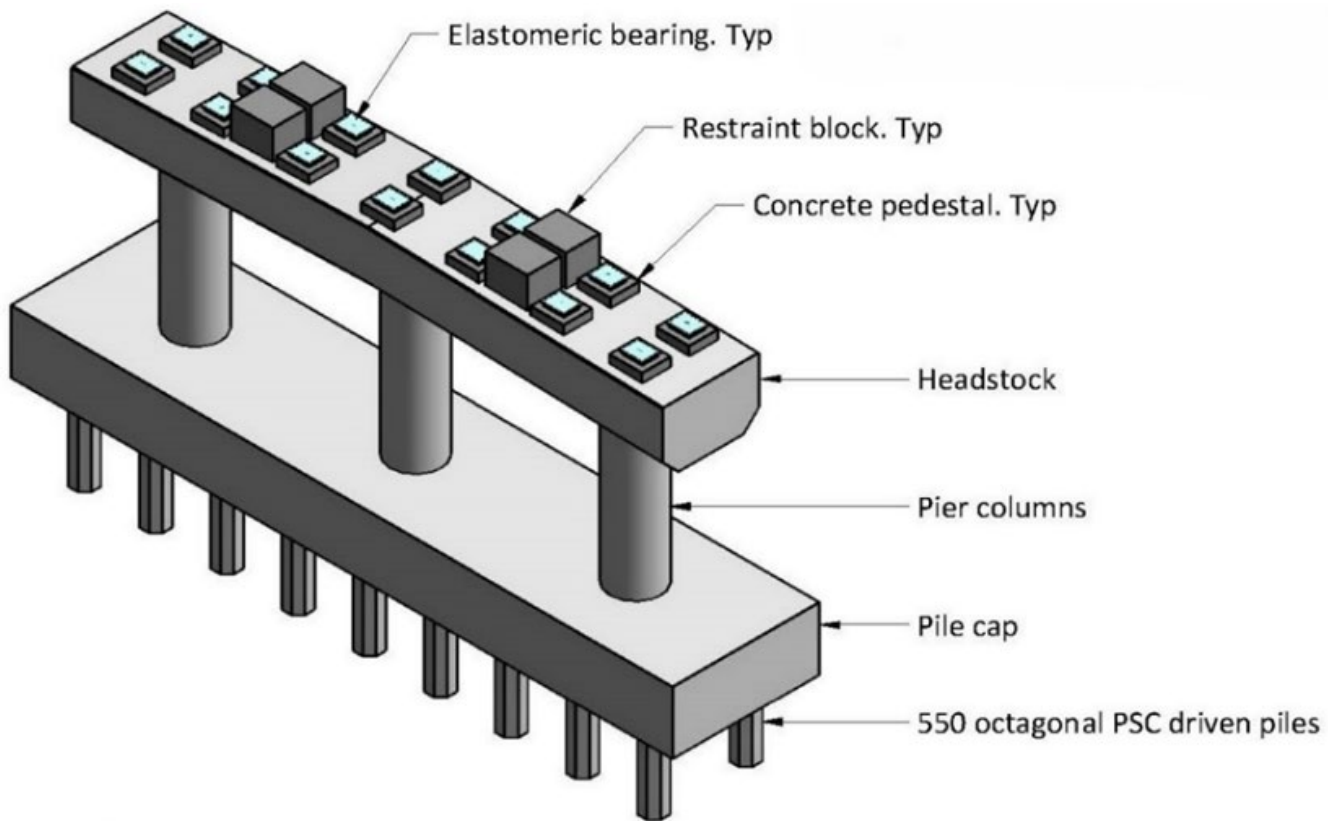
(b) – Example of a girder bridge pier drawn in perspective view
